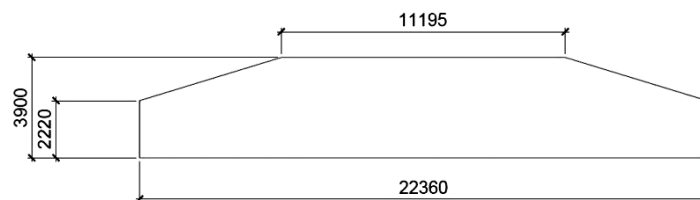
Suggested cross sectional diagram of poultry house structural dimensions
